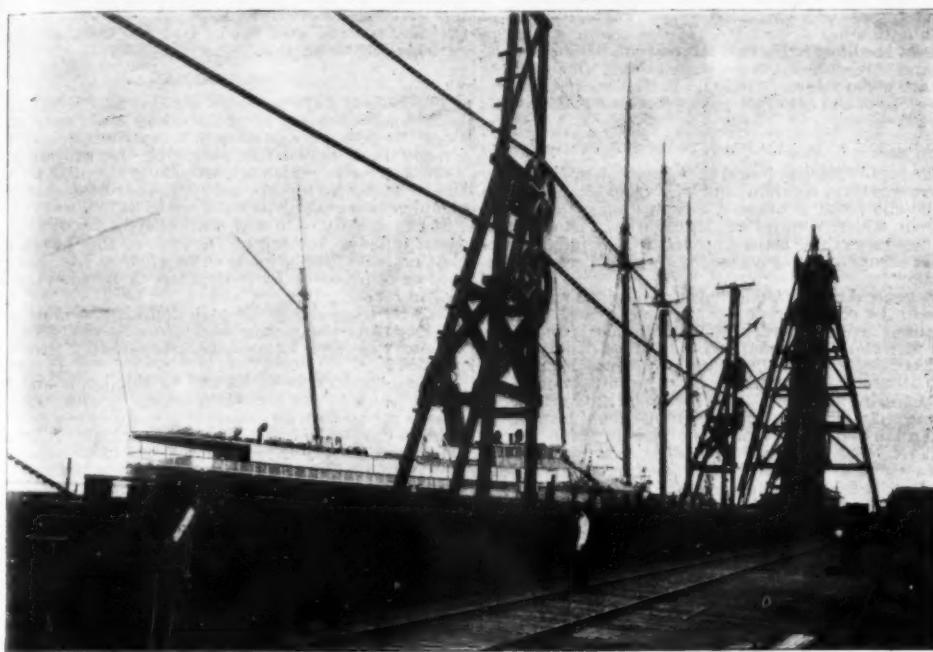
METHOD OF CARRYING OUTDOOR ROPE DRIVE.
